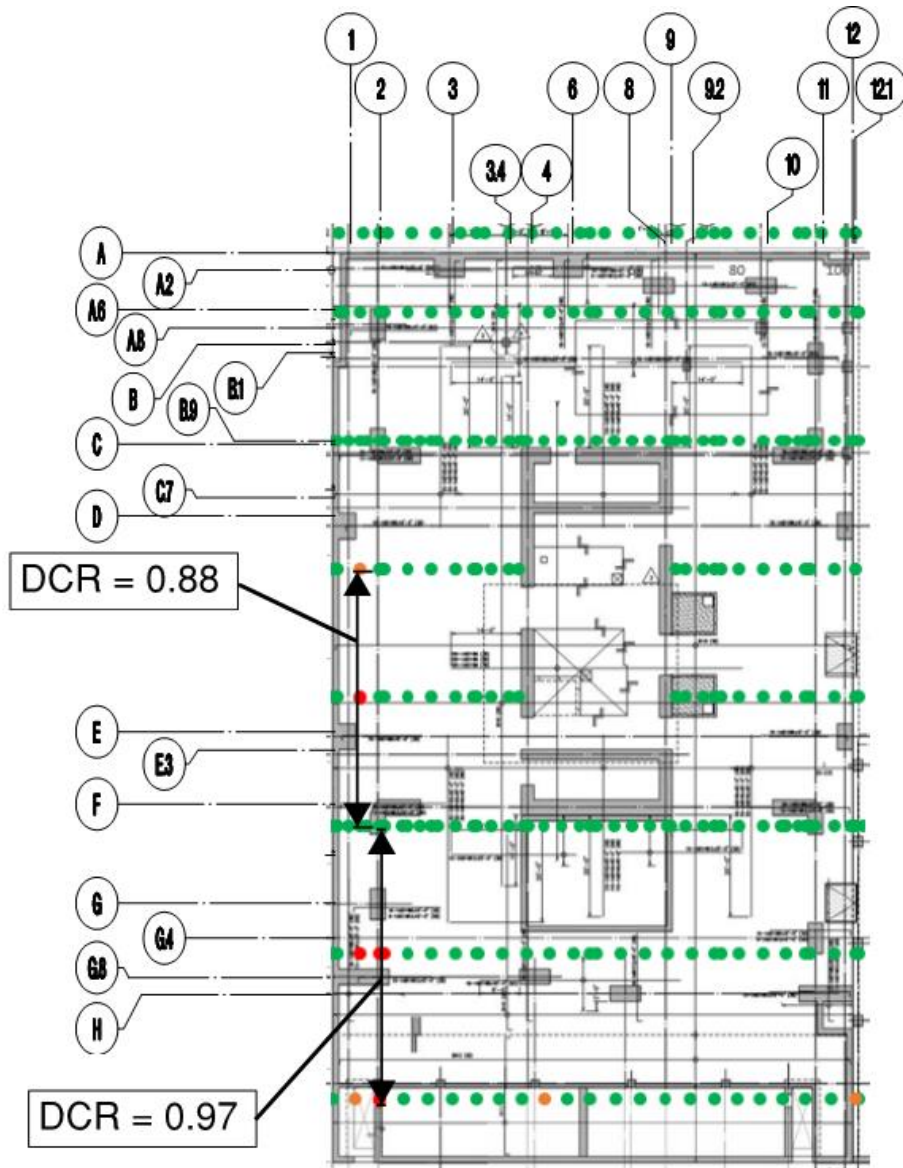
DCR Plot for East-West Bottom Reinforcement Design Strips for Gravity Load Envelope with Jacking Loads
